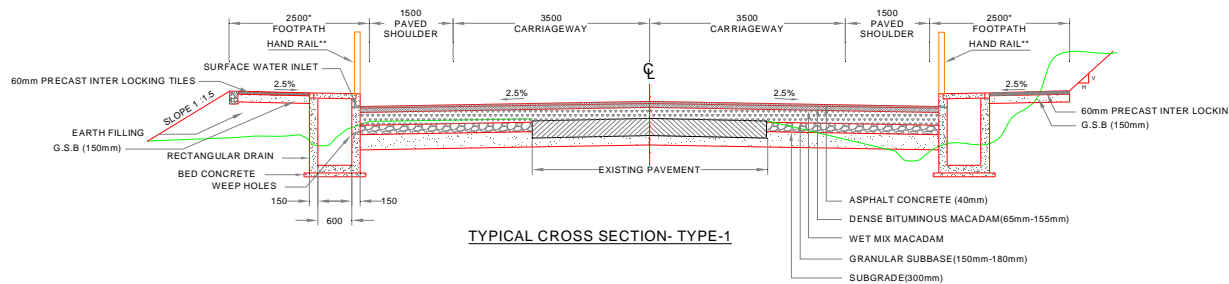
TYPICAL CROSS SECTION- TYPE-1
